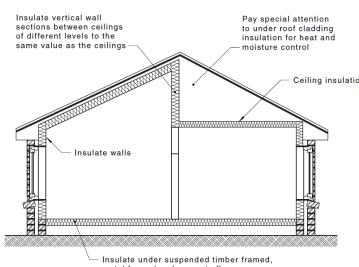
EXAMPLE OF THERMAL ENVELOPE WITH SUSPENDED FLOOR
